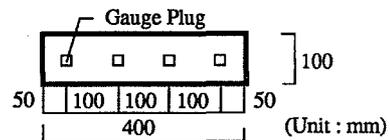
Positions of embedded gauge plugs in concrete specimen.
